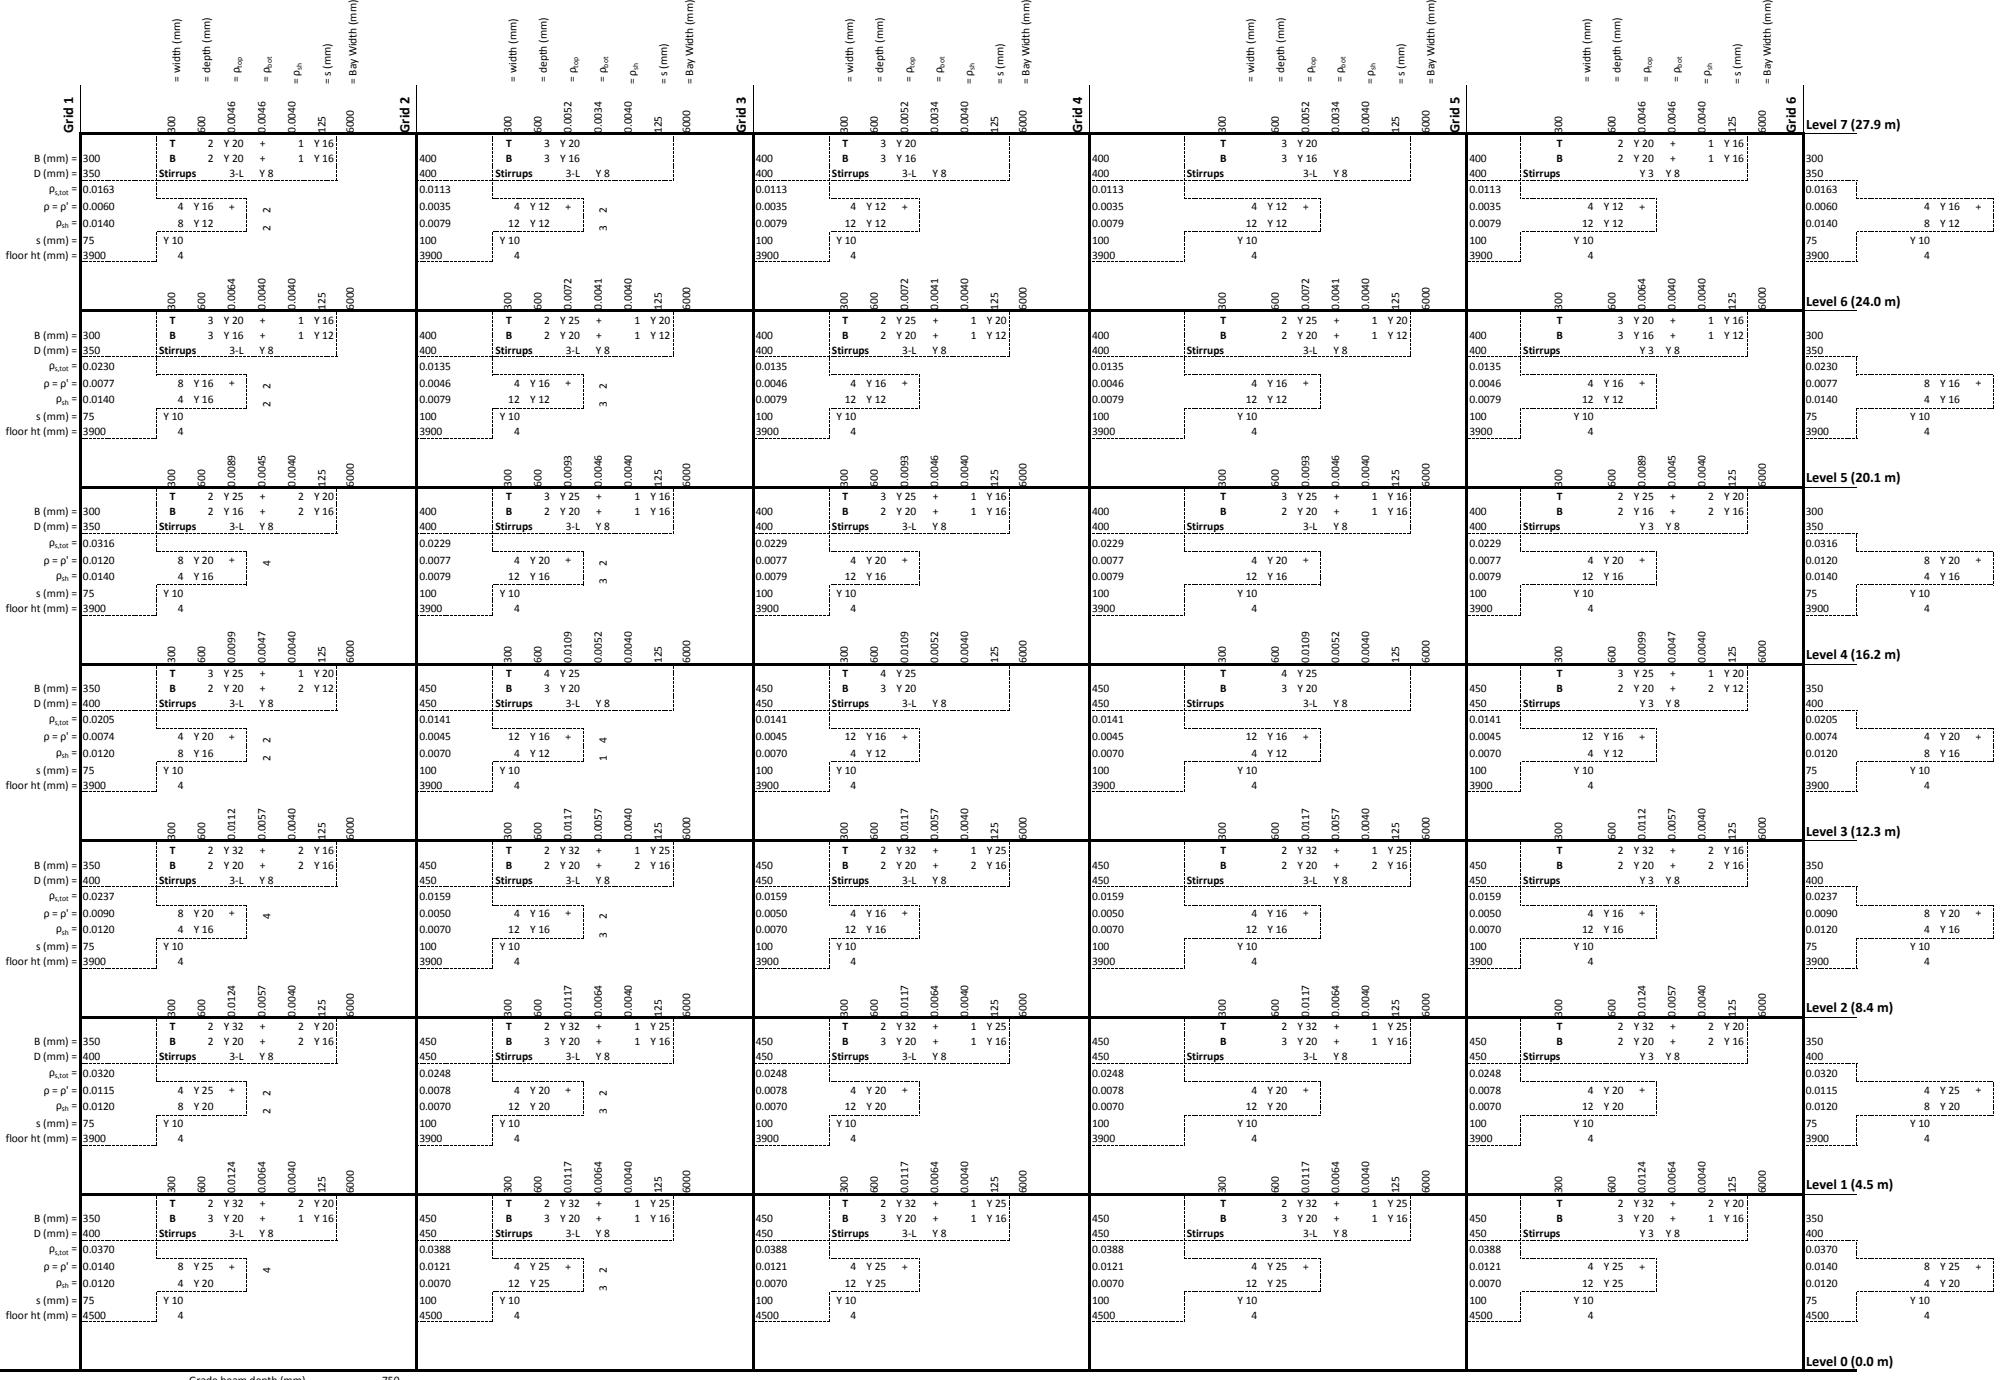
Provided reinforcement and modeling details for building ID 2237
